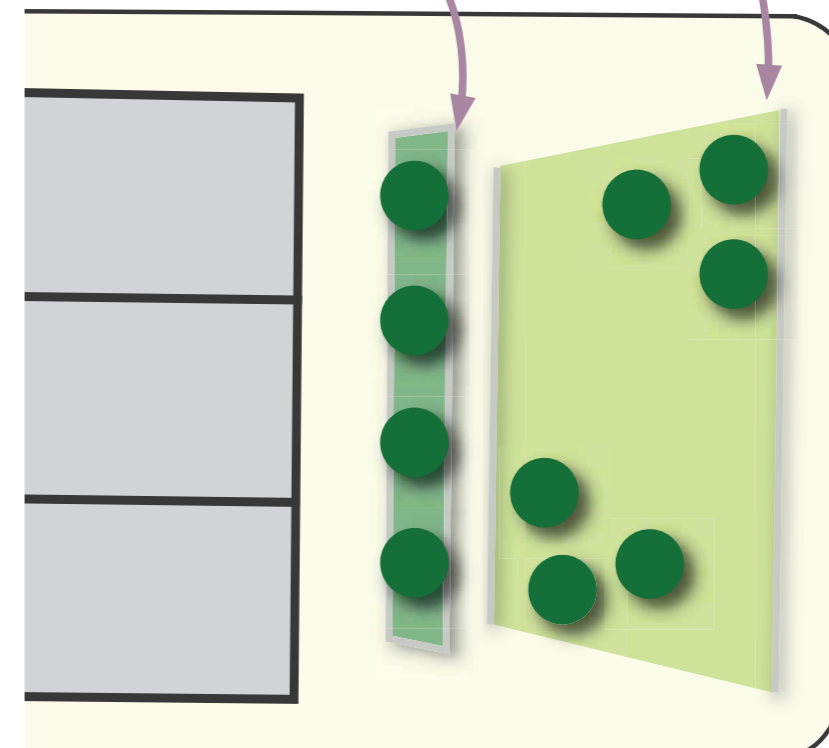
Sketch plan illustrating an arrangement of soft landscape features with mown amenity grass, shrub and tree planting.
